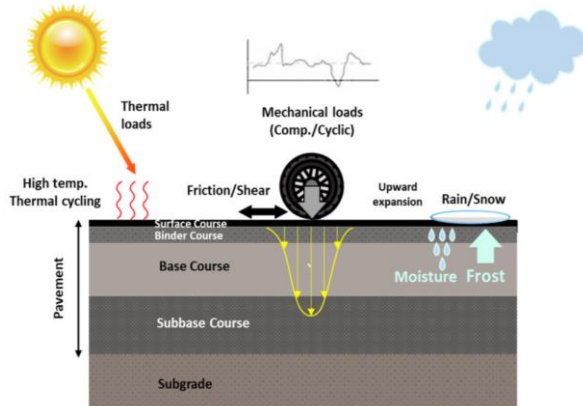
Some drivers responsible for asphalt pavement distress [256]
